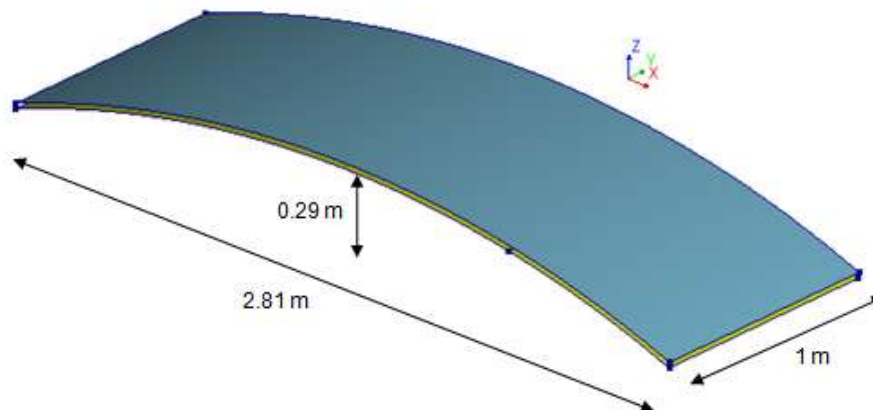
3D layered shell model, the blue shape corresponds to the reinforcement.
